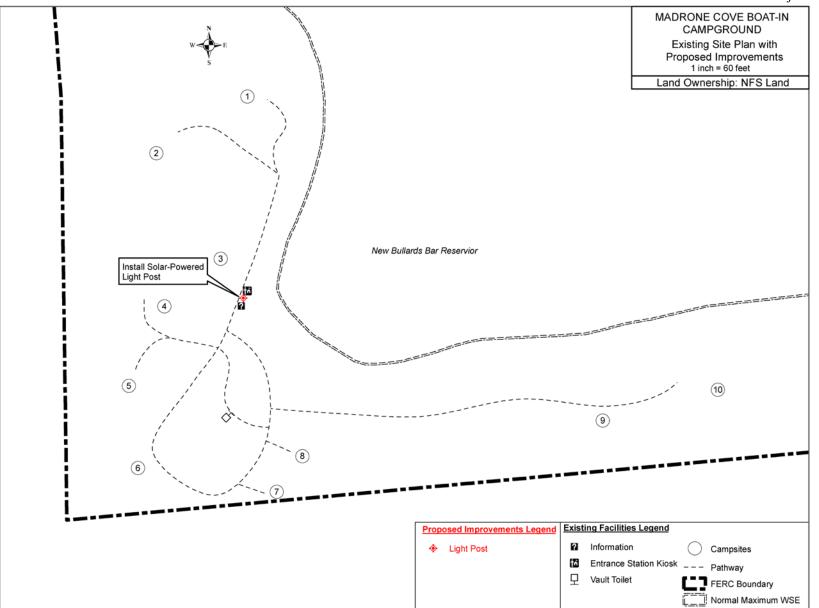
Existing site plan with proposed improvements for Madrone Cove Boat-in Campground.
